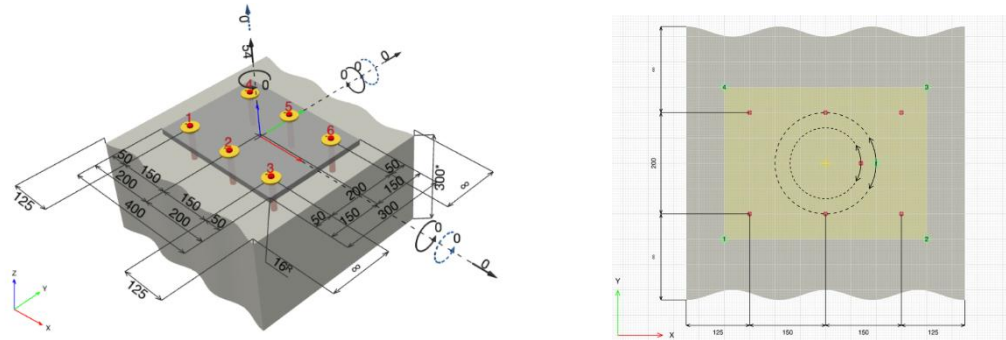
Baseplate connection using post-installed adhesive anchors
